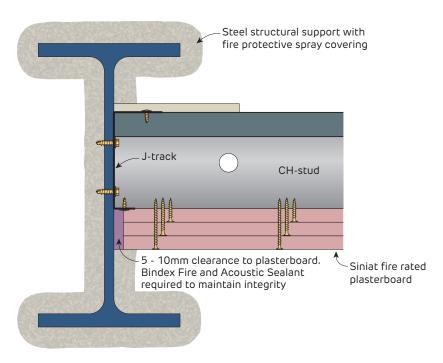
Shaft Wall Ceiling to Structural Beam Section
